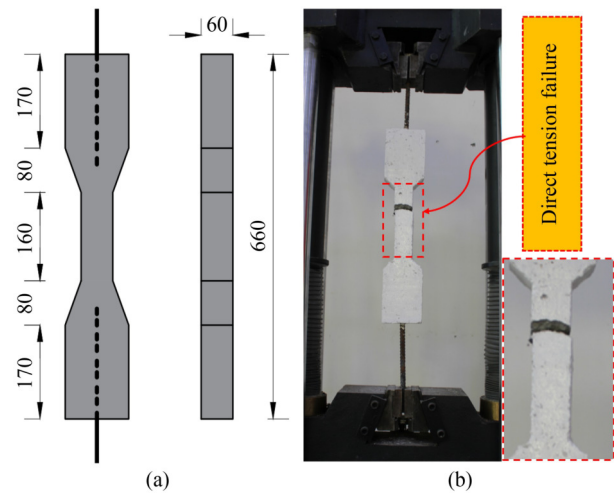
Direct tensile test for NC (unit: mm): (a) sample dimensions; (b) test of specimen.
